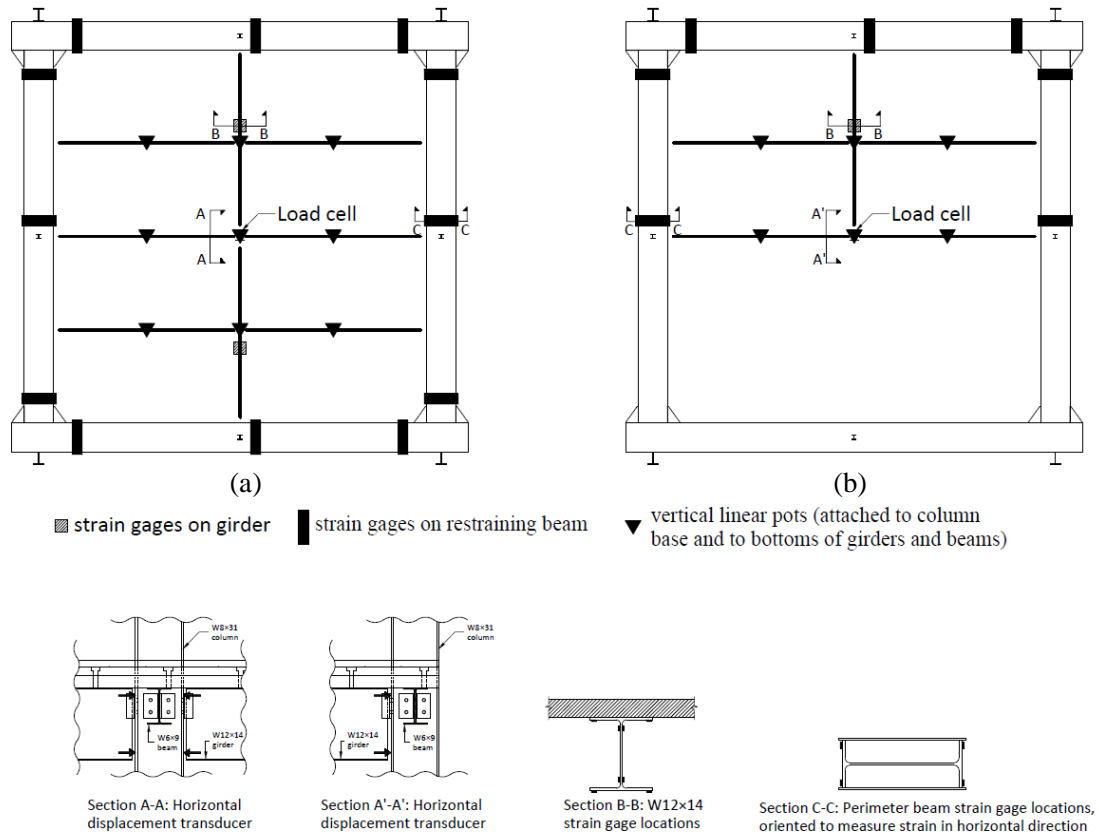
Instrumentation plan: (a) ICL specimen, (b) ECL specimen
